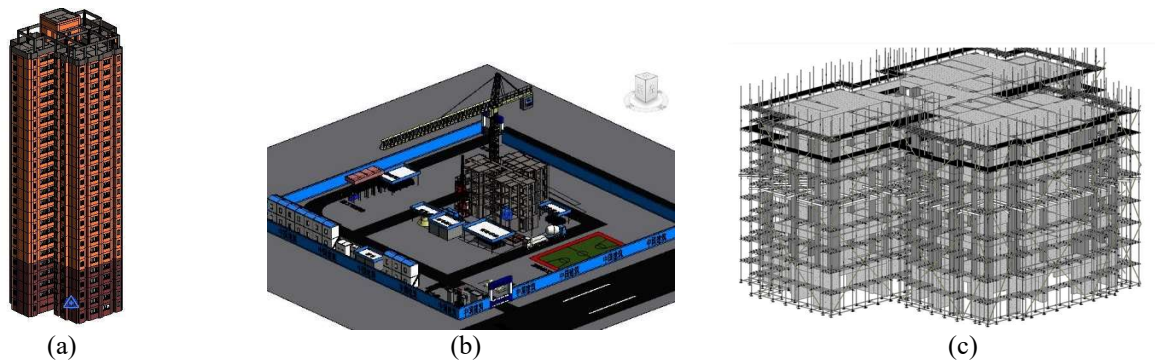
example (a)Example of 3D model (b)Example of site layout drawing (c)Example of temporary construction model
